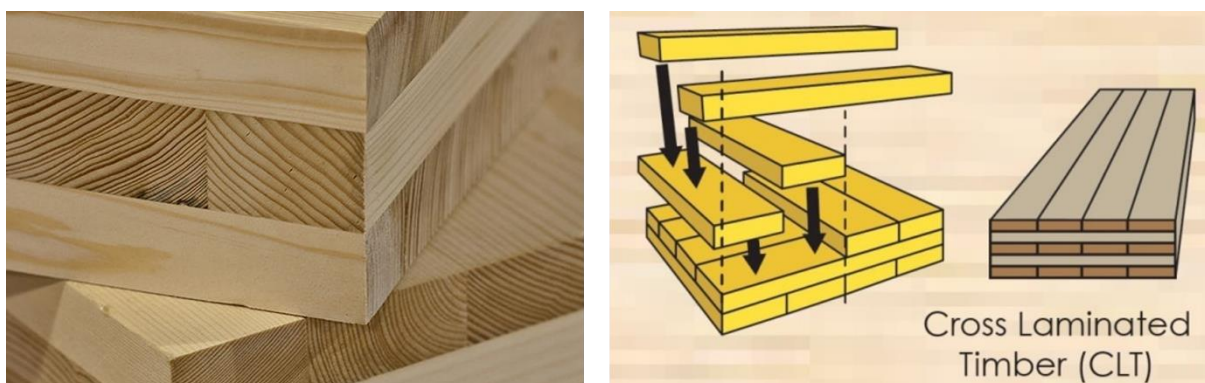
CLT and positioning of timbers used in CLT construction (URL-7).
